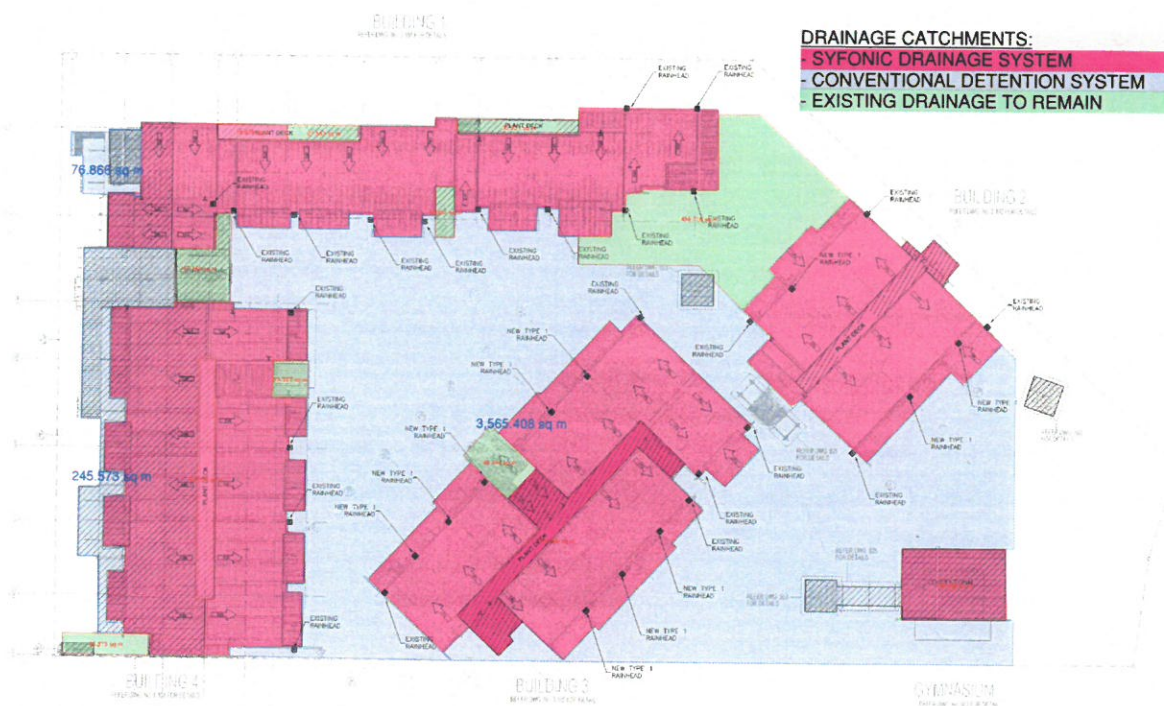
SITE PROPOSED DRAINAGE PLAN
